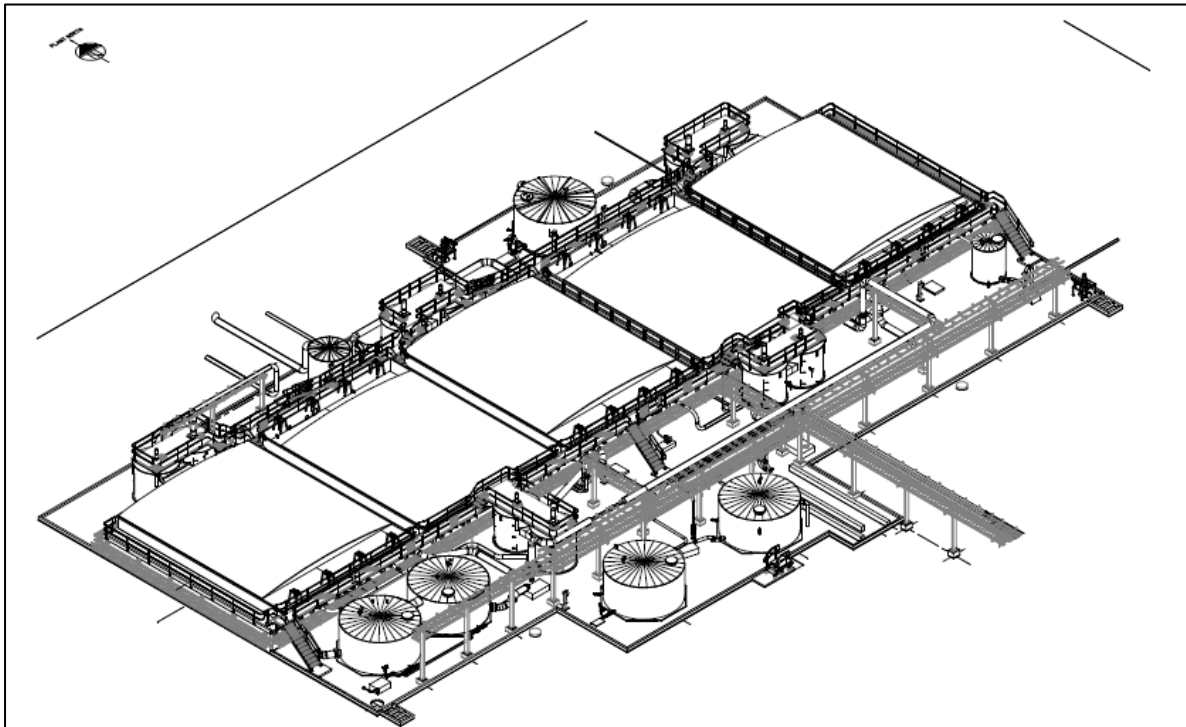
3D view of Solvent Extraction facility (Main Plant)
